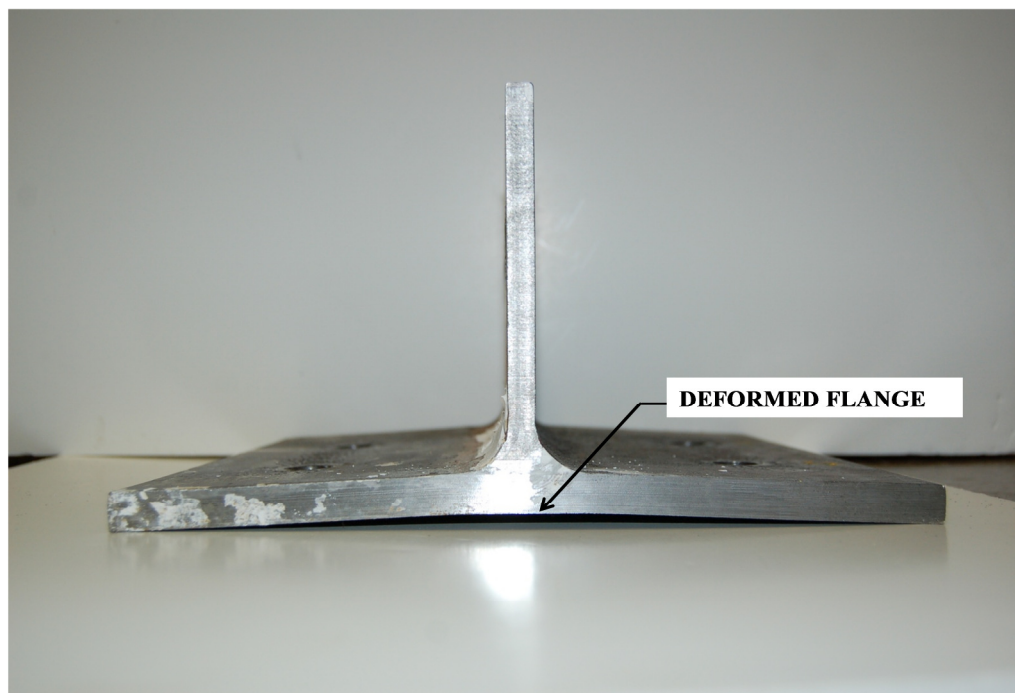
Deformed Shape for Specimen 1.5b Post-Testing.
